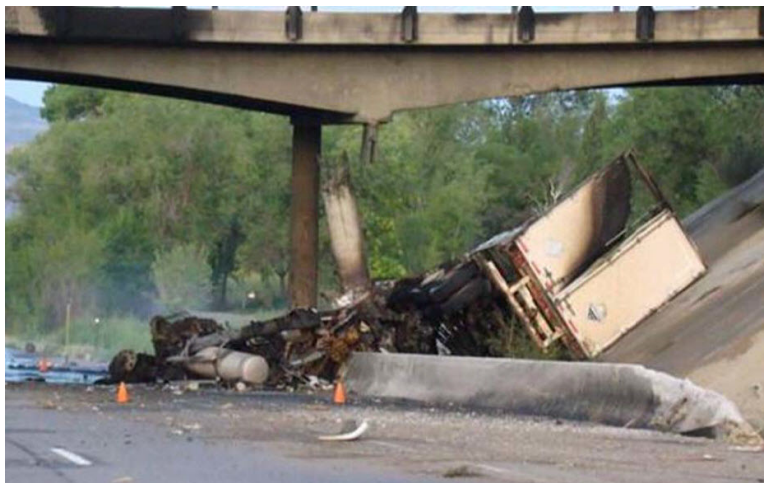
Pier column damage, protective barrier in place (2)
